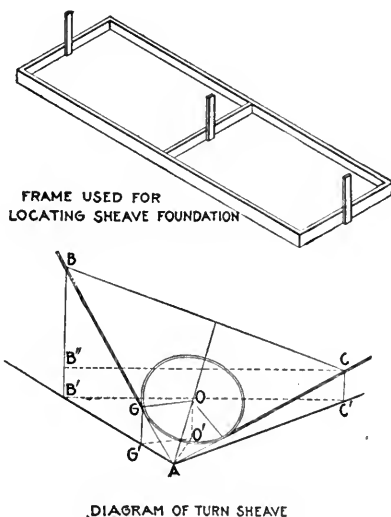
TURN SHEAVE LOCATING FRAME AND GUIDING DIAGRAM.
